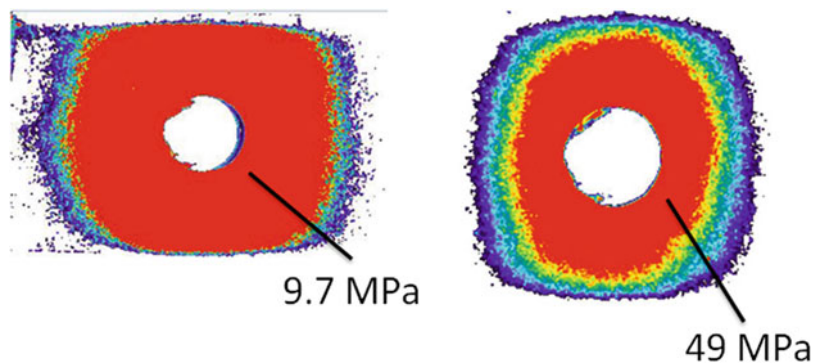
Low (left) and medium (right) film measurements taken in the actual beam assembly
